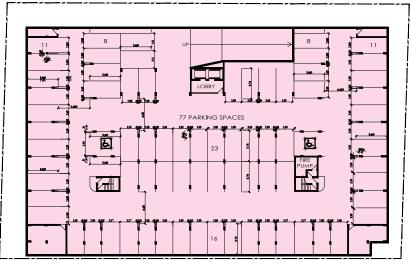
Floor plans showing at-grade and below-grade parking spaces
